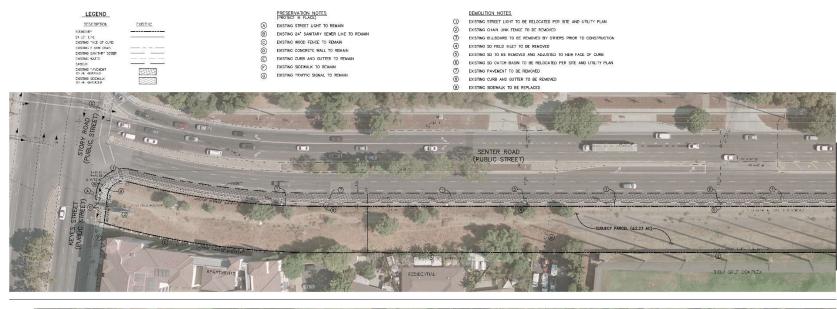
Proposed Senter Road Right-of-Way Dedication and Demolition Details
